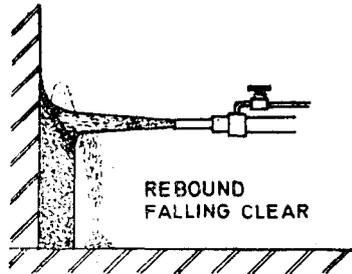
SHOTCRETING ON VERTICAL WALL FROM BOTTOM TO TOP
